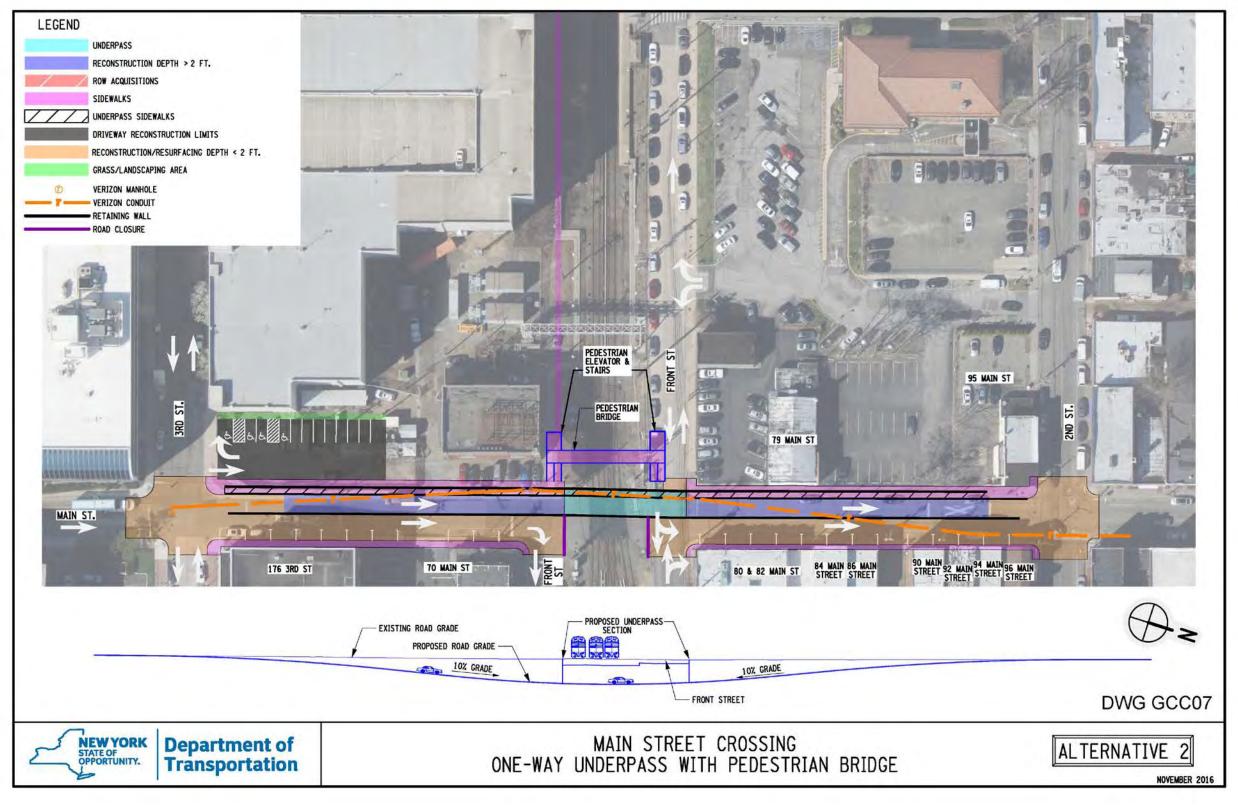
Main Street Crossing (Alternative 2: One-Way Underpass with Pedestrian Bridge)
